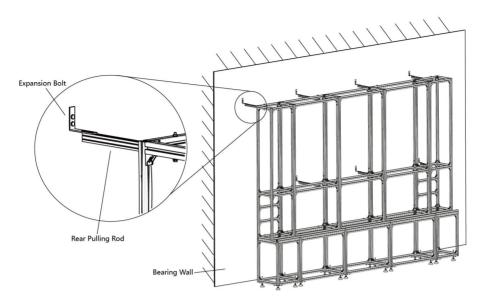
Fix the Rear Pulling Rods onto the Bearing Wall
